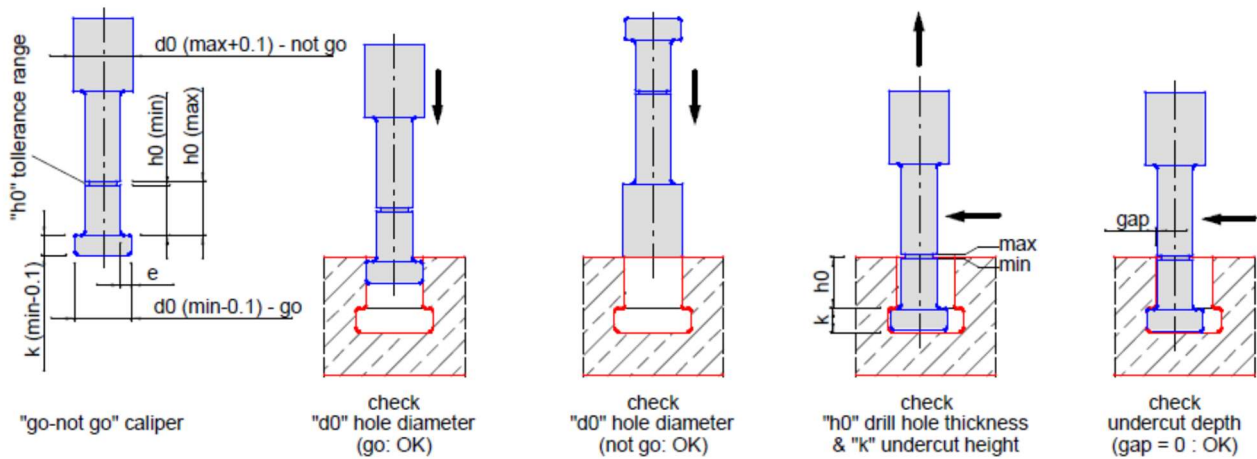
Dimension checking of the undercut drill hole by “go-not go” calliper
